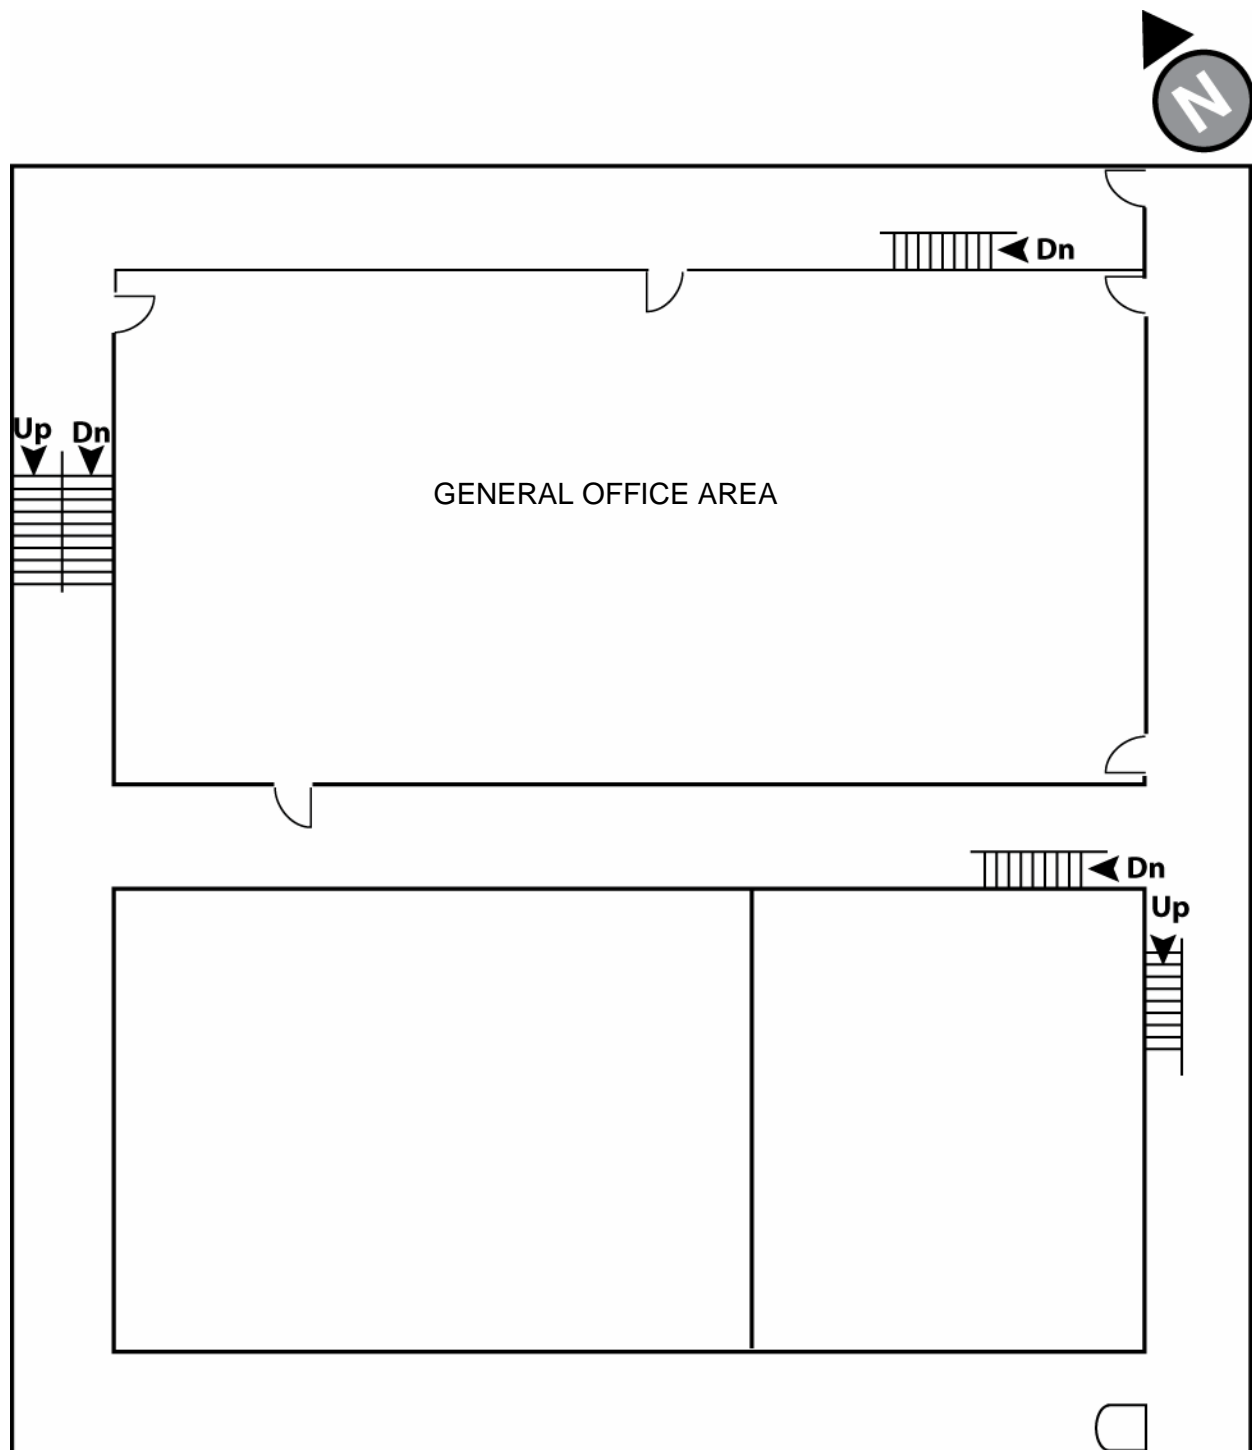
Floor Plan for Building 9825H, Special Projects Building, 2nd Floor
